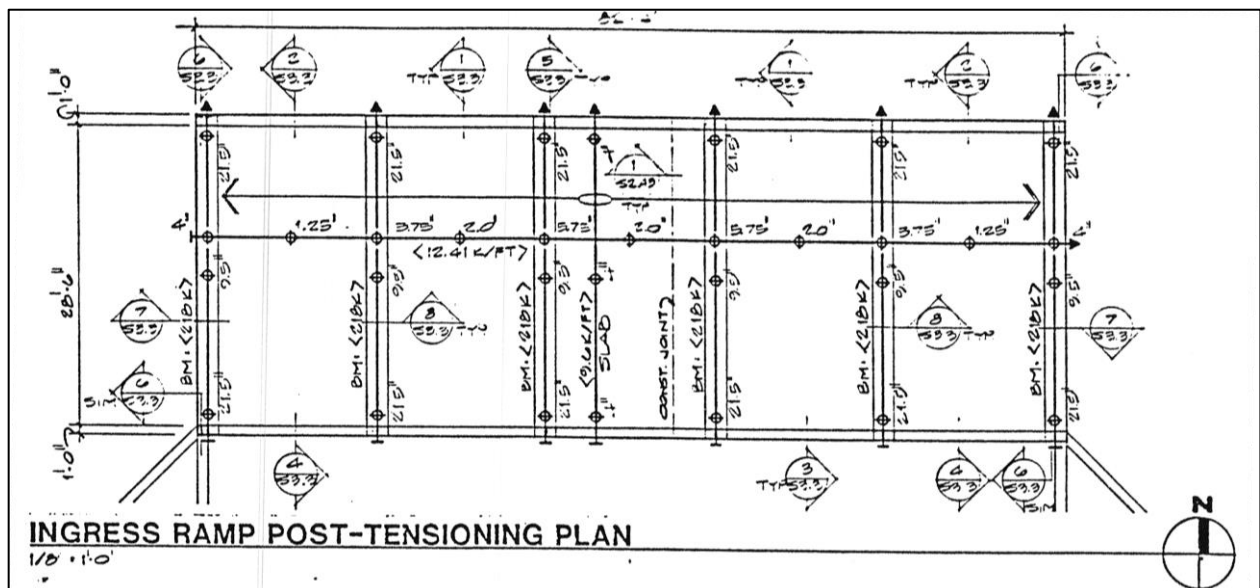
Example of the as-built 1988 structural drawings showing the post-tensioning in the entrance (“ingress”) bridge from the ingress ramp to the first floor of the garage.
